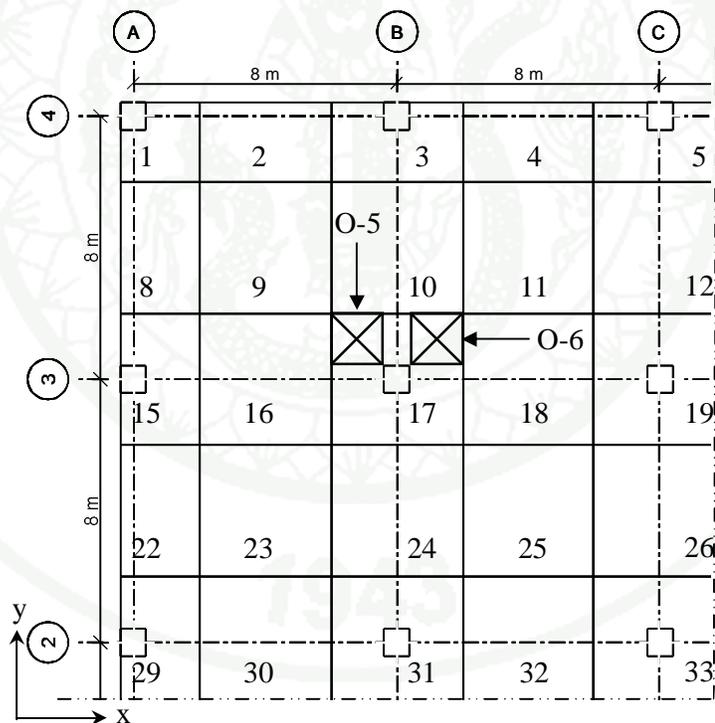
Flat plate model with openings at the area common to intersecting column strips [O-5 and O-6]
